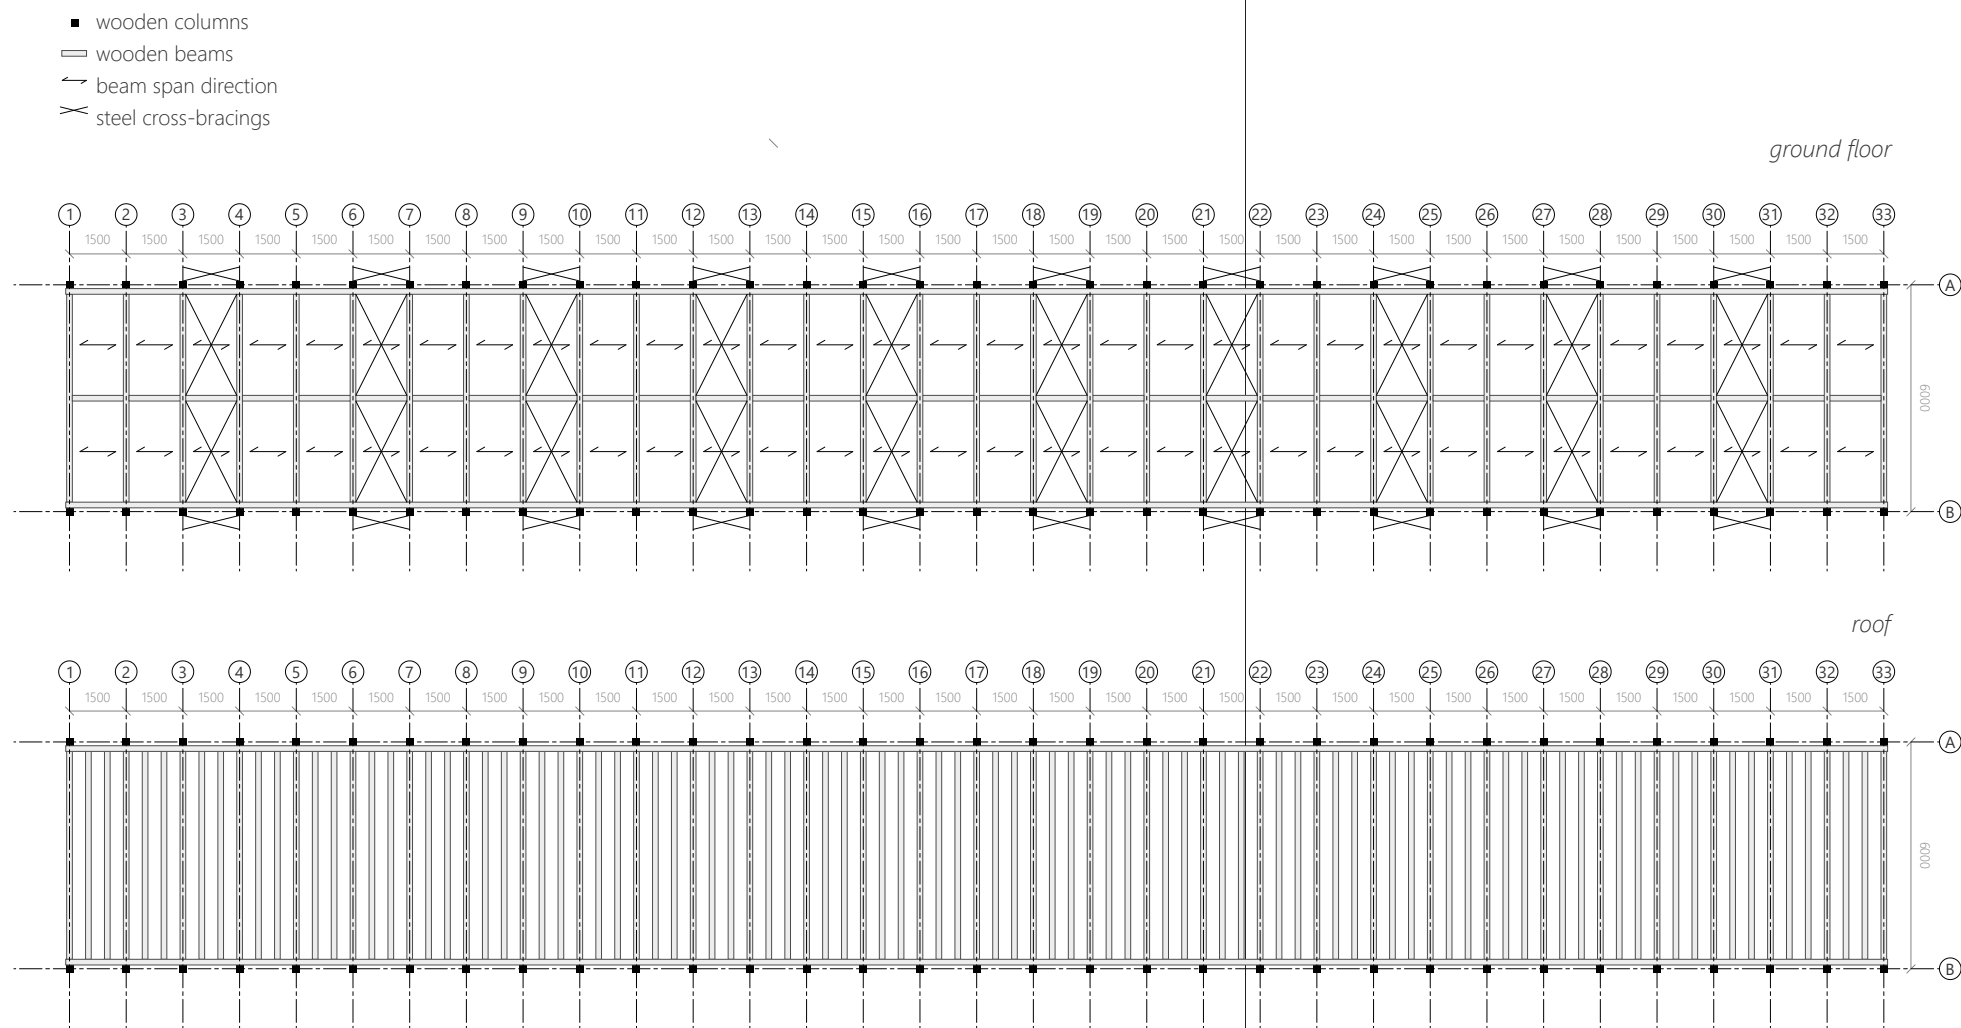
Load-bearing floorplan 1:200 (Own work, 2024)
